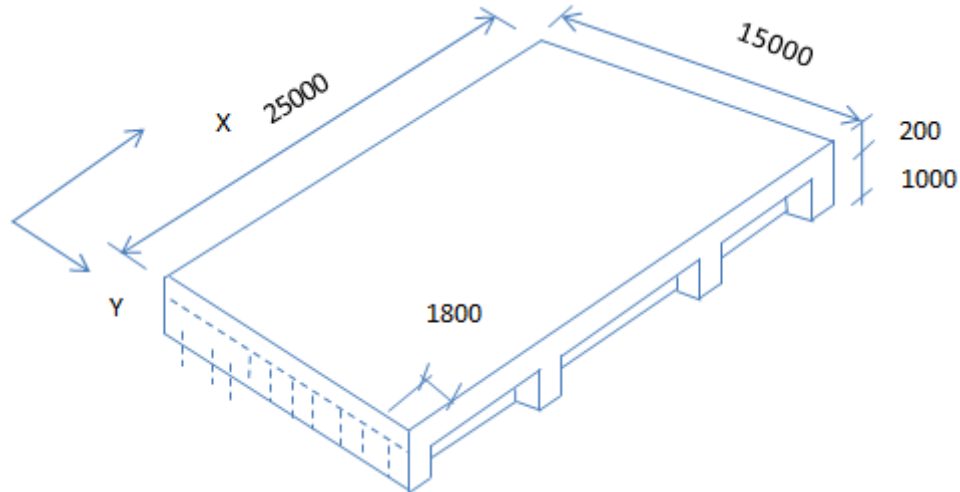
Reinforced concrete slab-beam bridge deck with seven ribs and four diaphragm.
